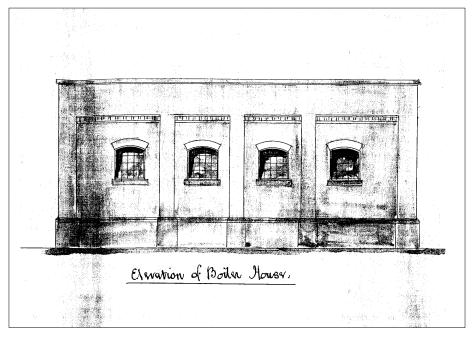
East elevation of the 1889 adopted proposal showing the Boiler House 18
